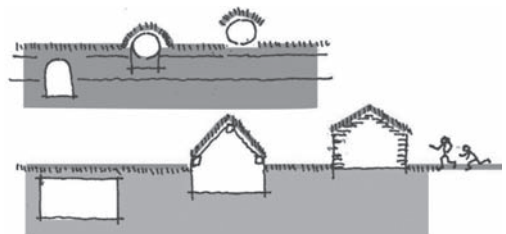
Three crucial locations of architecture: underground, in the ground and on the ground. The most natural and the oldest roofing material is turf.
